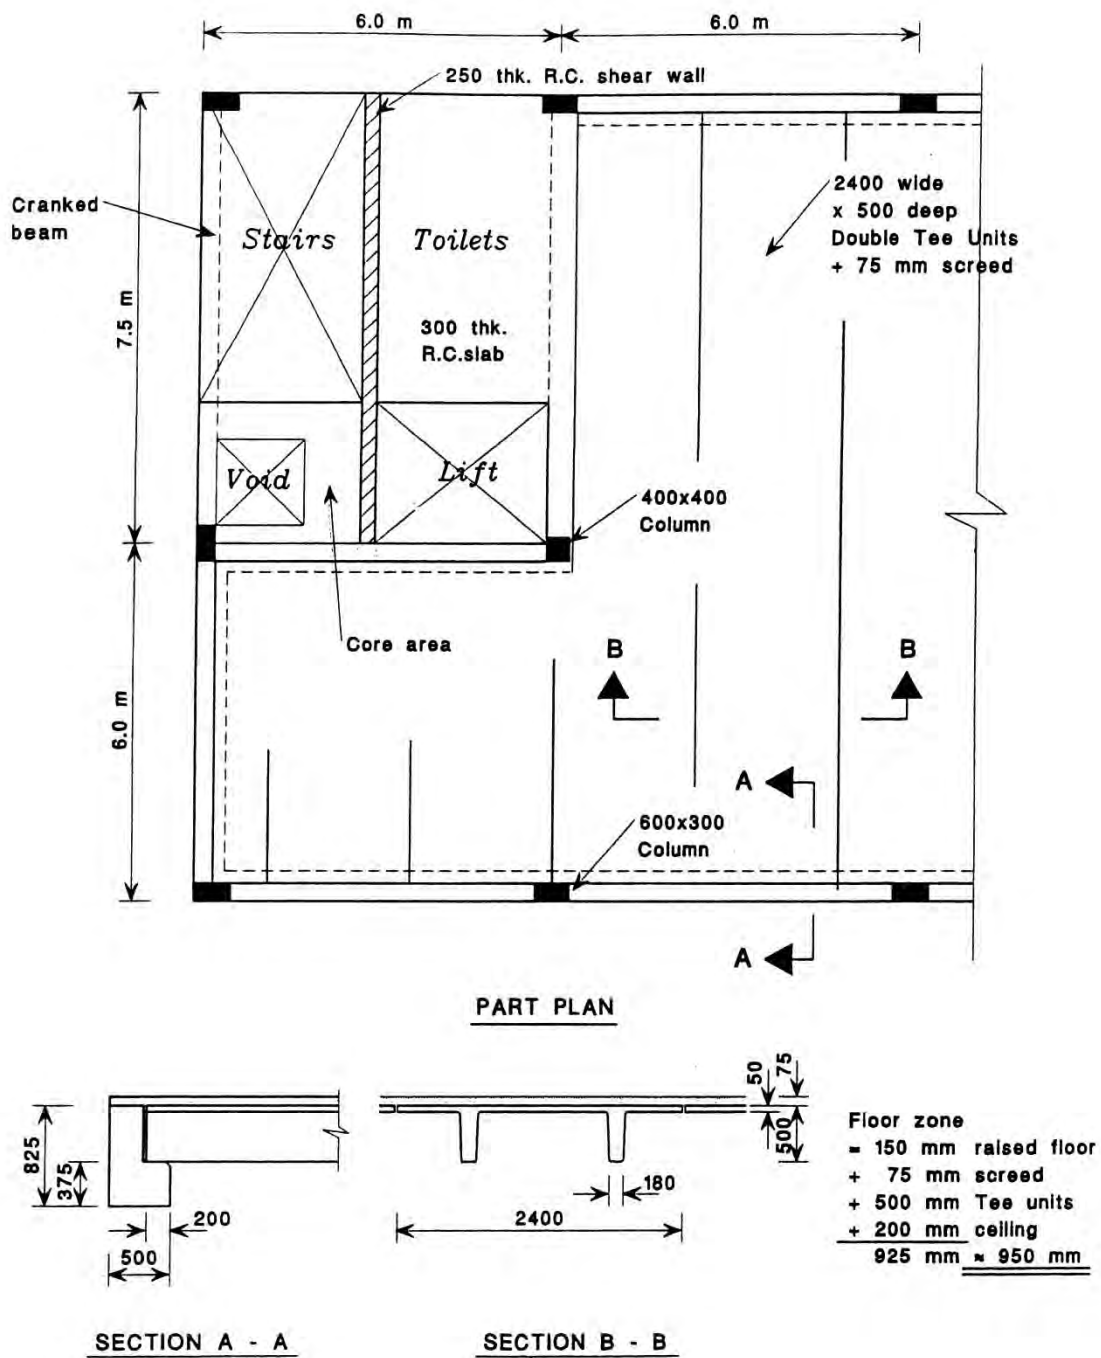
Pre-cast double T units on reinforced concrete edge beams (SCI 2004)
